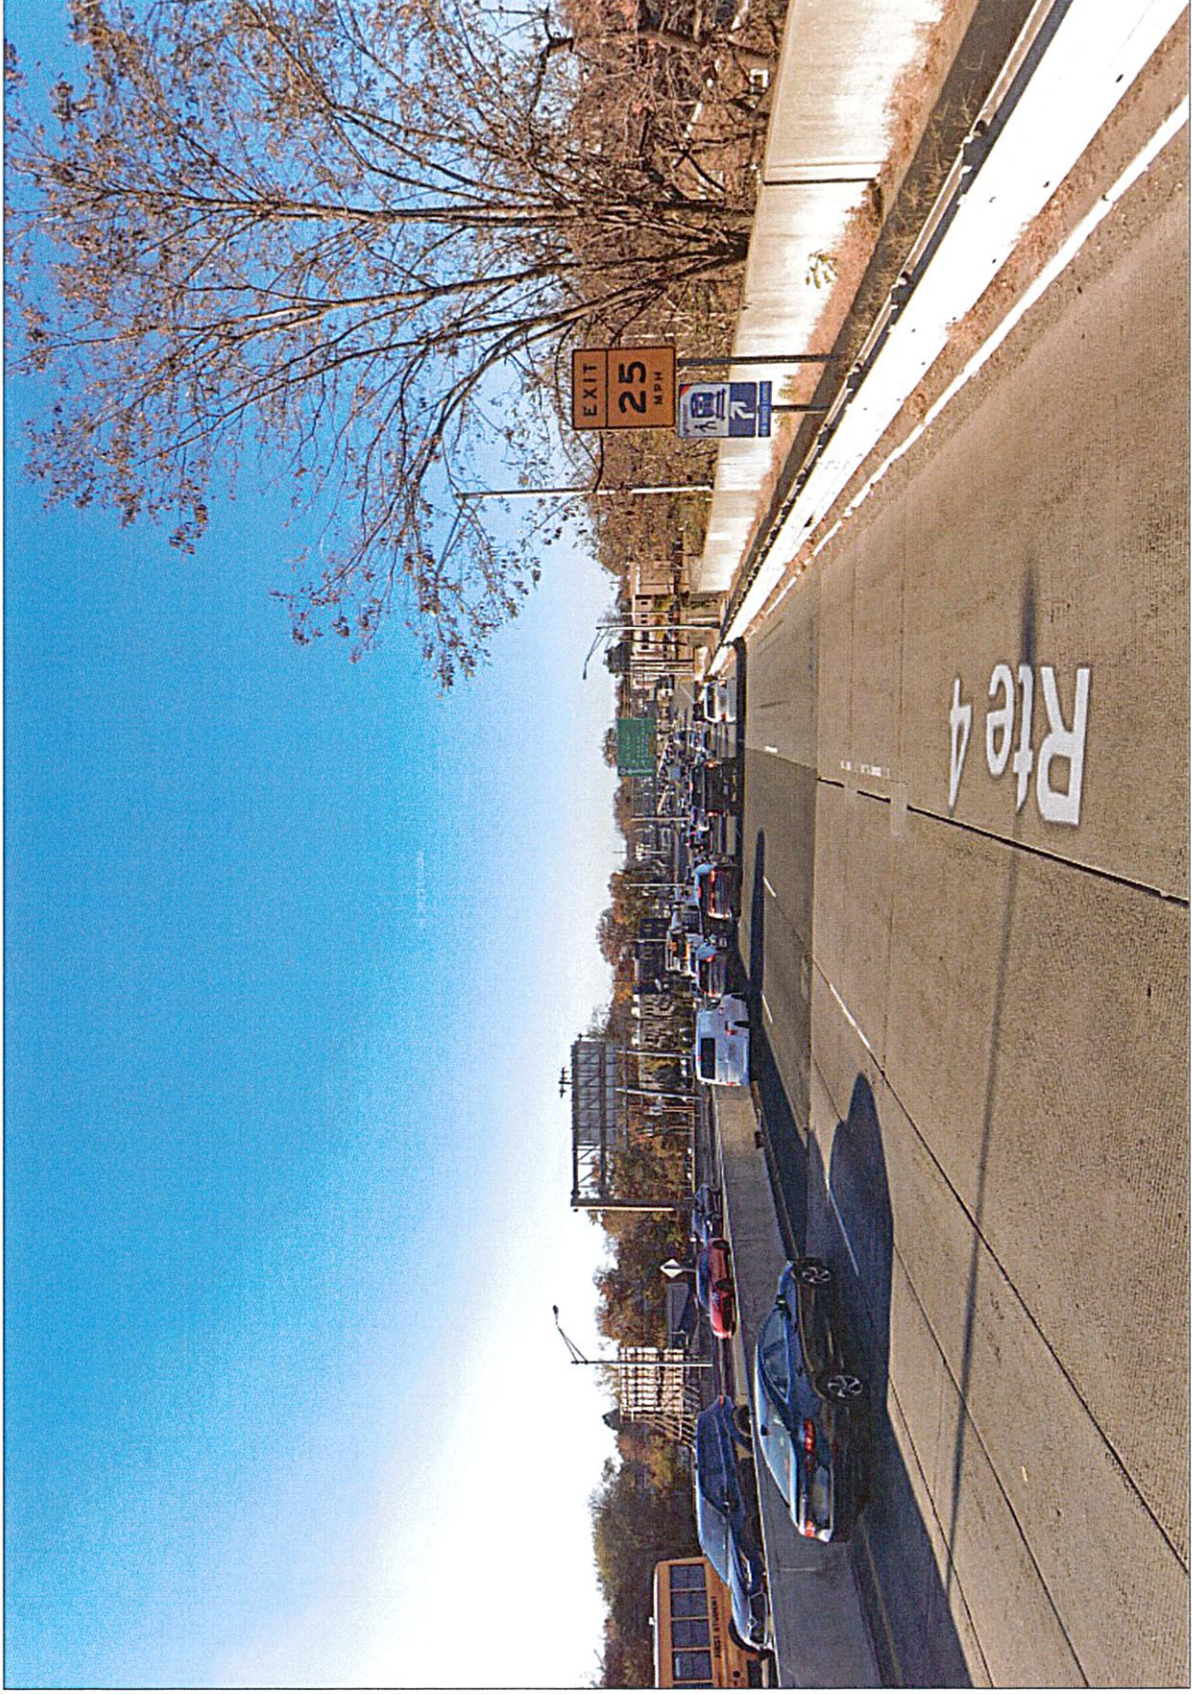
NJSH 4 WB. APPROXIMATELY 800 FEET EAST OF PROPOSED SIGN
